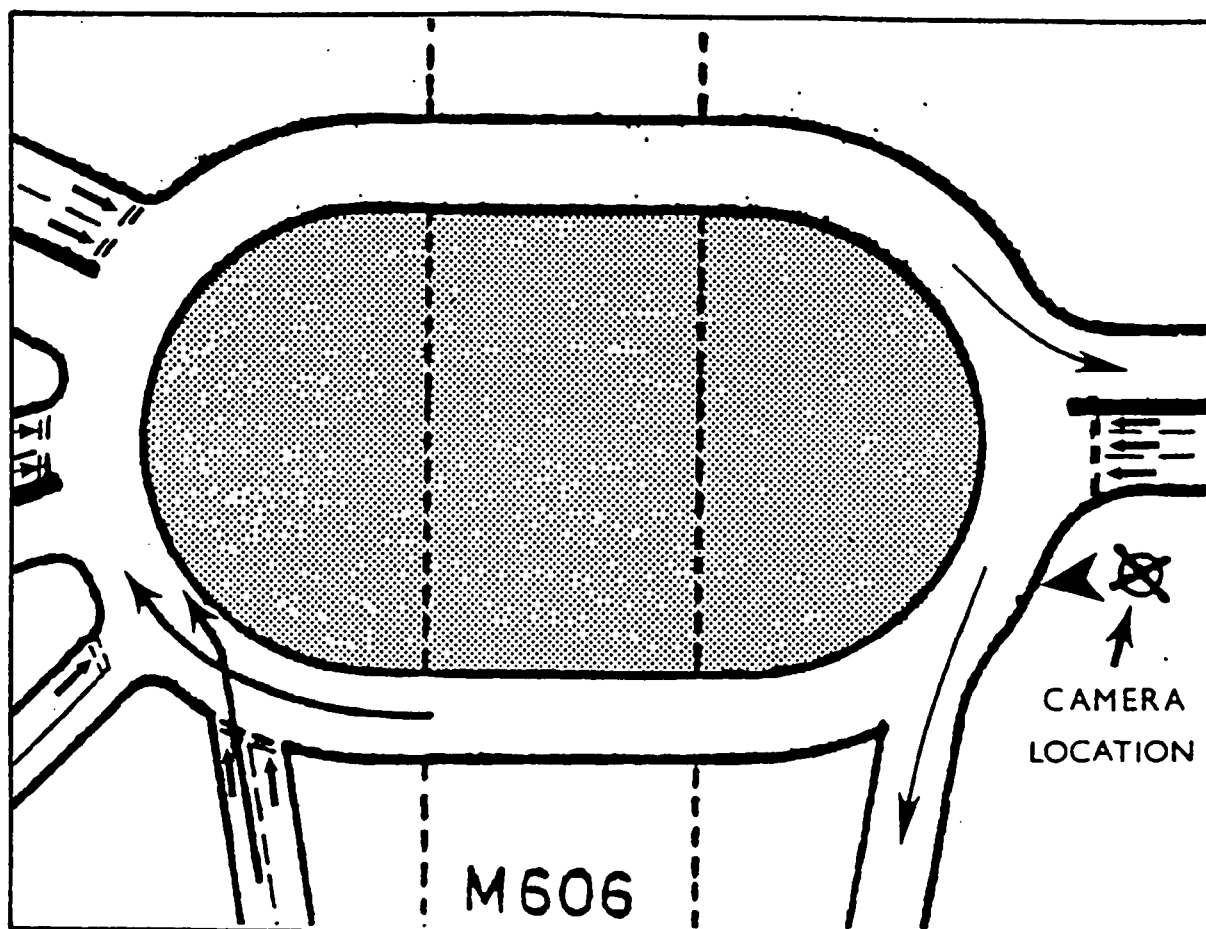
(M606/A6036) Rooley Lane Roundabout - BRADFORD.
